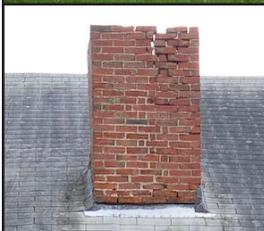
Chimney has many loose bricks and needs to be rebuilt from the attic floor up.
